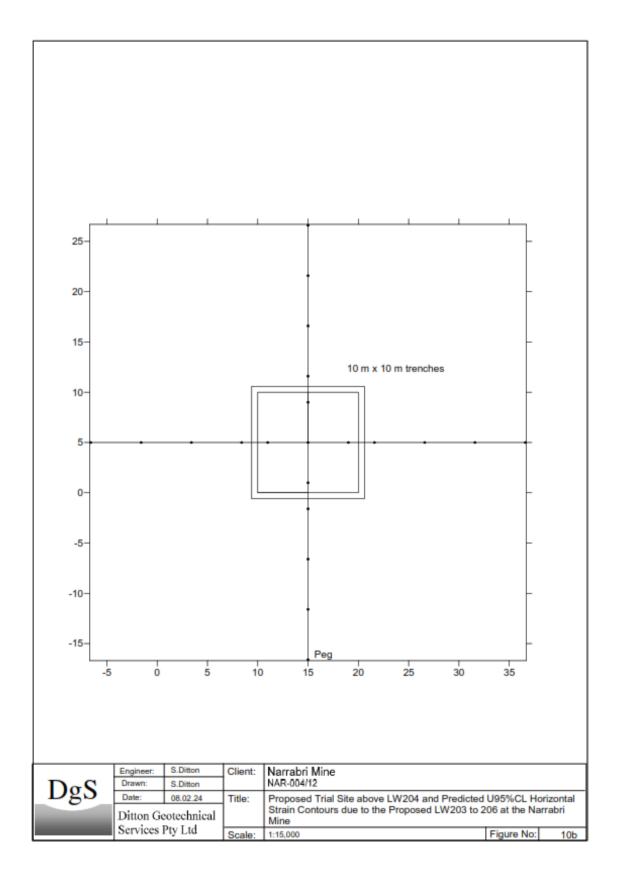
Proposed LW204 trial site layout (DGS, 2024)
